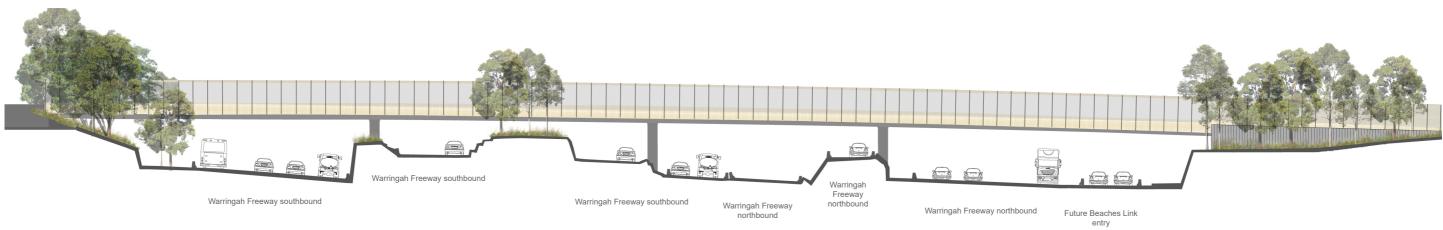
Falcon Street Active Transport Bridge - Elevation D 1:400
